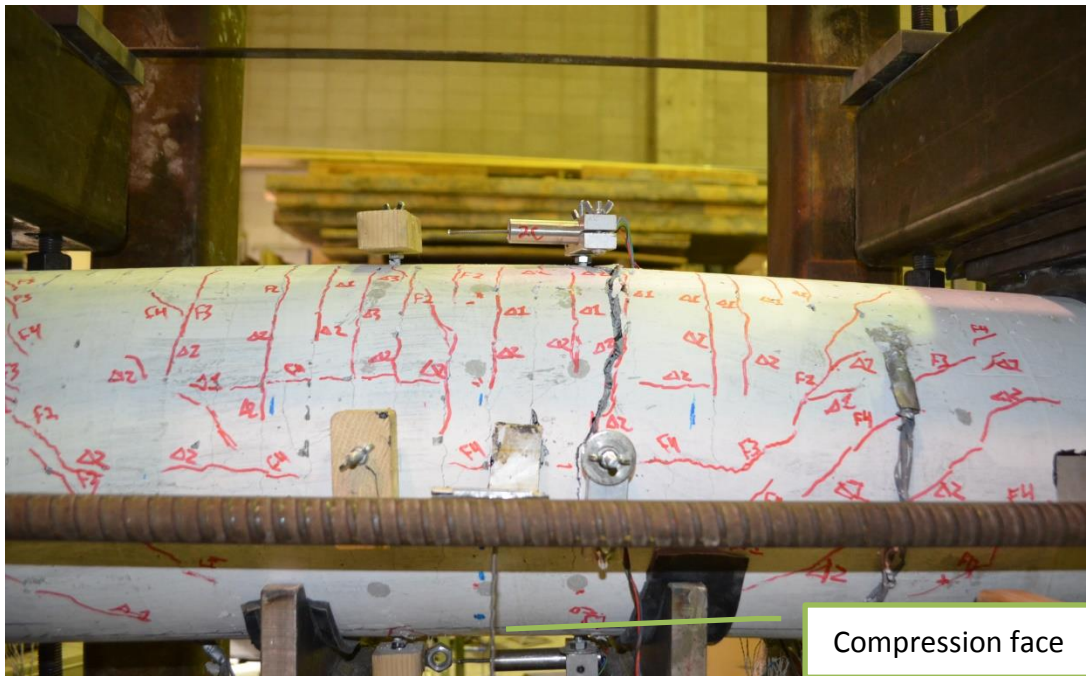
Specimen H2C1-M after Tension Steel Failure
